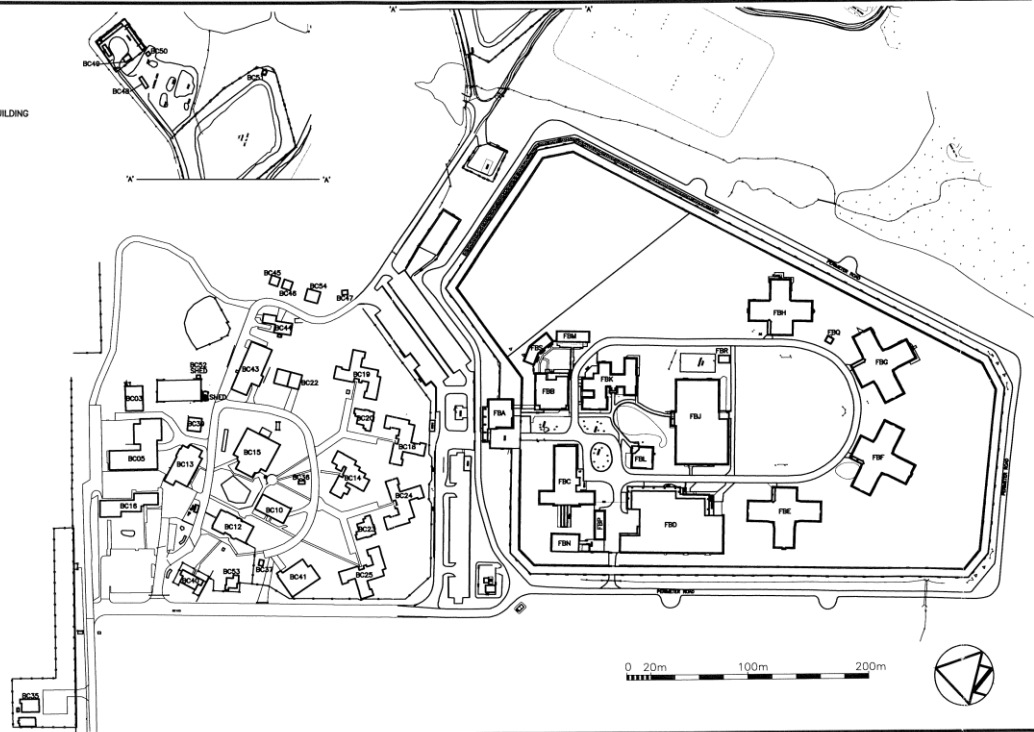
Facility Layout of Beaver Creek and Fenbrook Institutions
